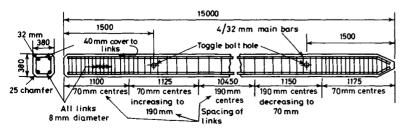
Design of precast concrete pile suitable for fairly easy driving conditions and for lifting at third point from one end or at positions shown
